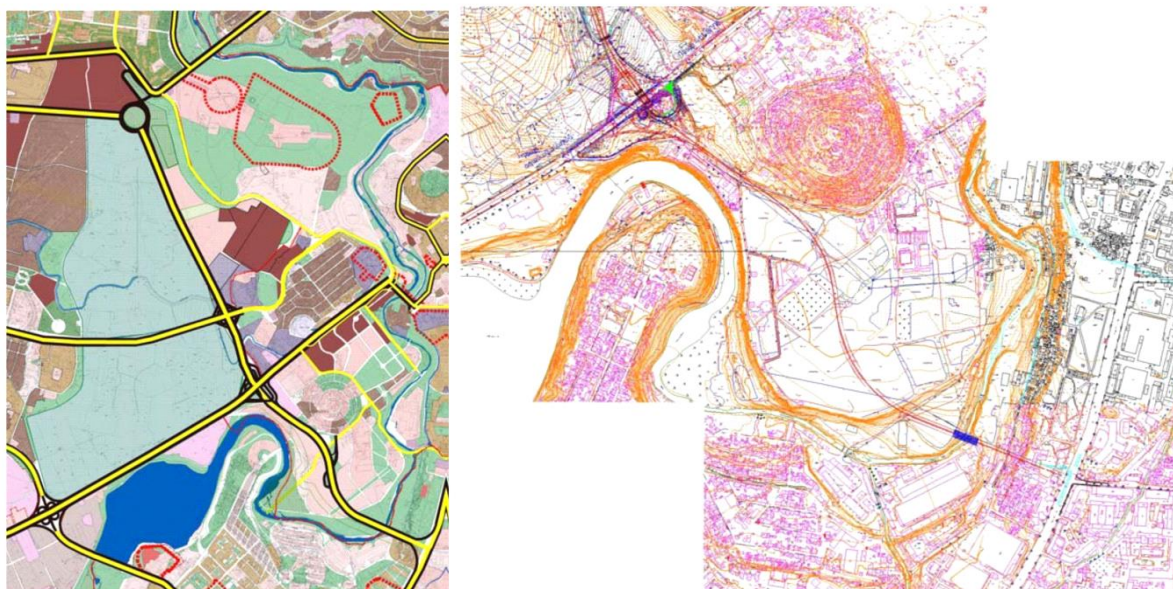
Leningradyan Street – Isakov Avenue – Arshakunyats Avenue city primary road (on the left). The layout of city primary road extending from Isakov Avenue to Arshakunyats Avenue (on the right).
